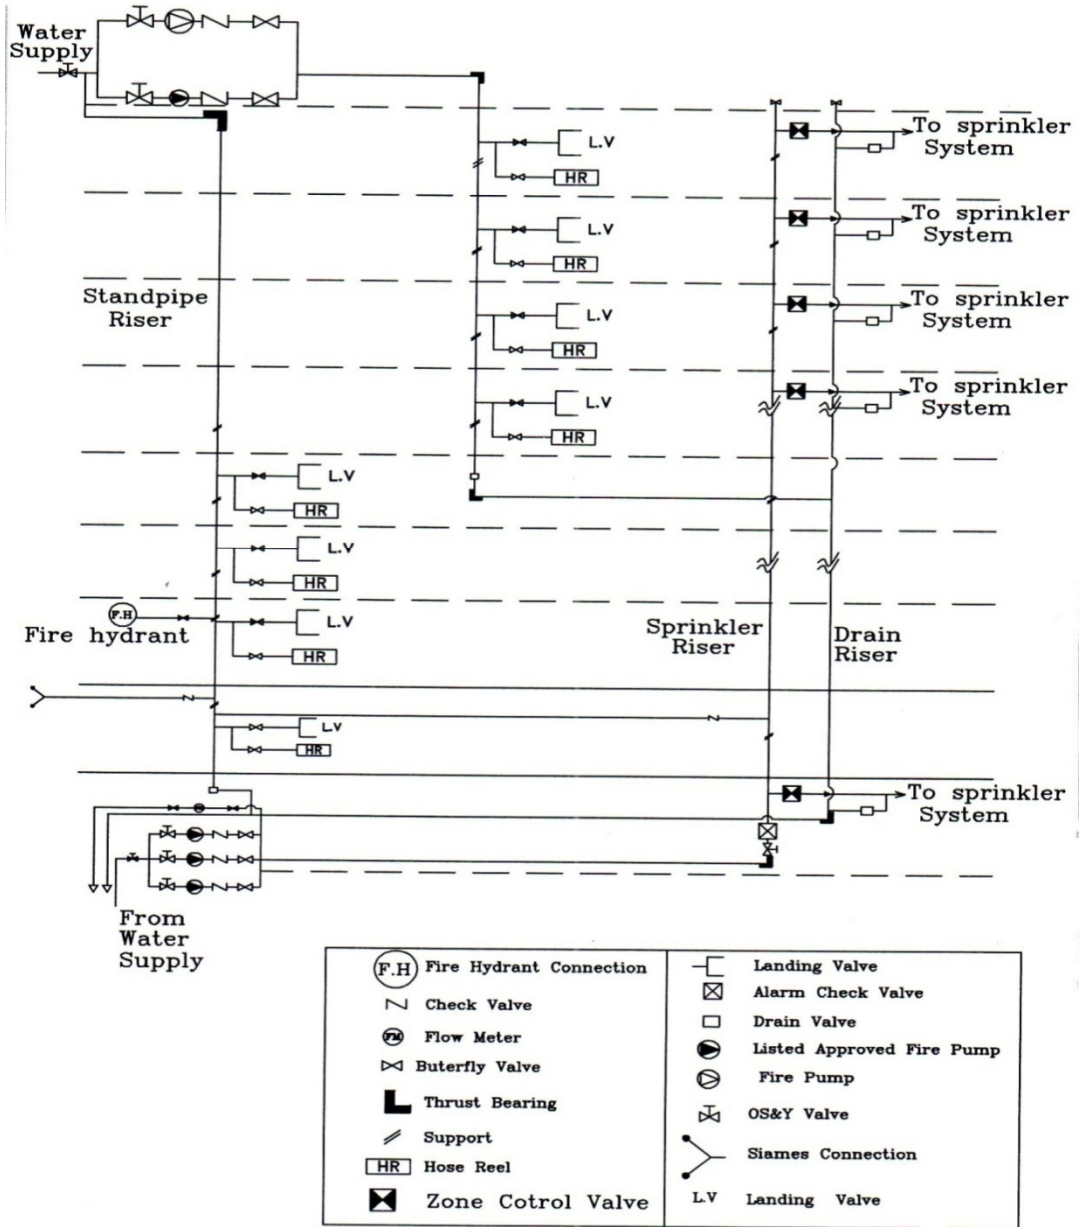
Designed Model for Sprinkler Floor Assembly of High-Rise Building.
